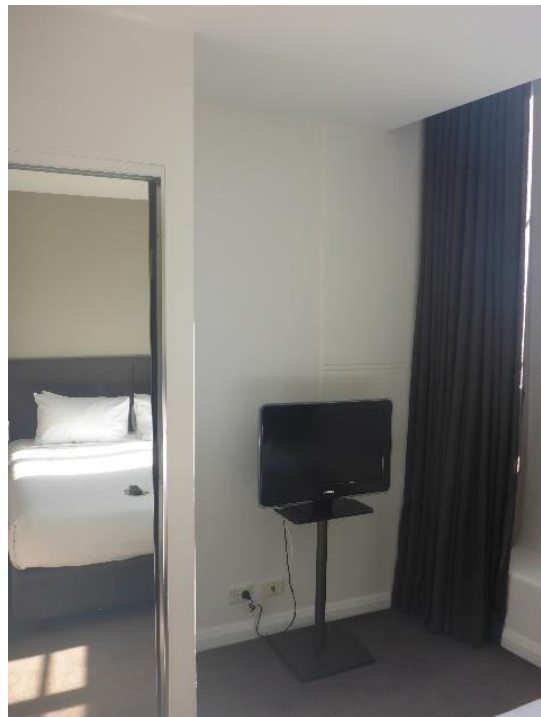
Bedroom wall. Note the interface with the original structure and the later partition
